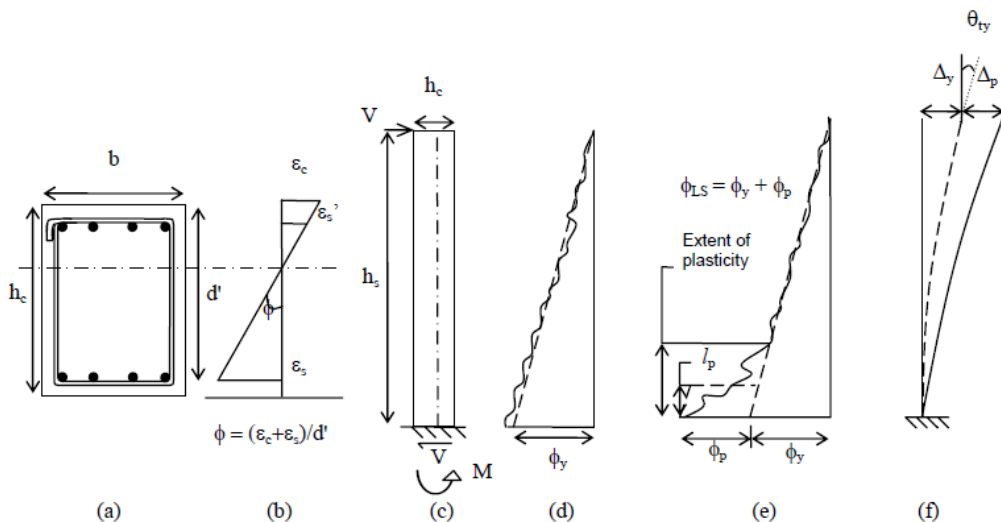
(a) typical poorly-confined reinforced concrete column section, (b) strain profile and definition of curvature, (c) prismatic reinforced concrete cantilever, (d) curvature distribution with height when the section at base reaches yield curvature (limit state 1), (e) curvature distribution with height at post-yield limit states, (f) components of total lateral tip deflection (modified from Paulay and Priestley 1992)
